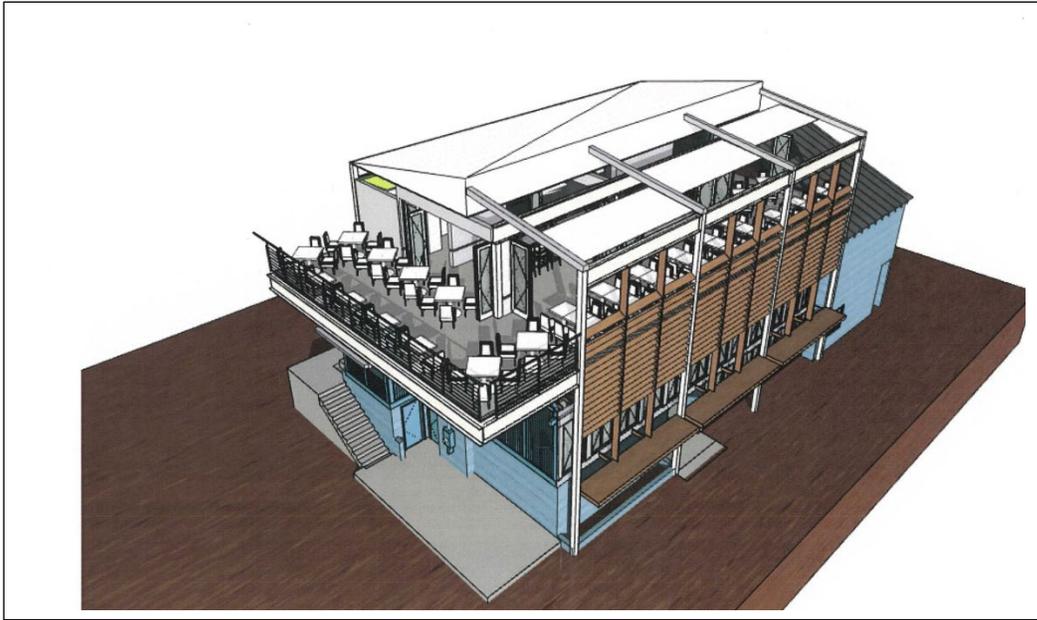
Schematic Elevation of Building with Proposed Third Floor Addition
